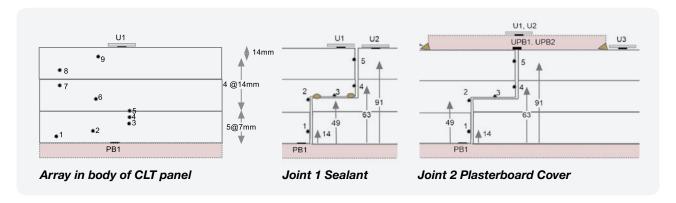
Sections through CLT panels showing joint details and thermocouple positions.
